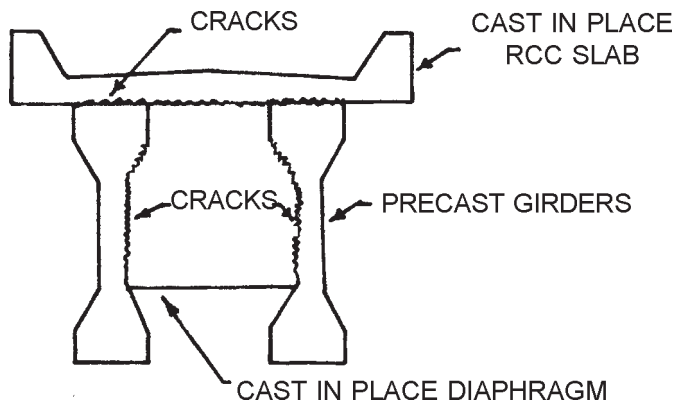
Cracks at interface of precast and cast in place concrete elements
